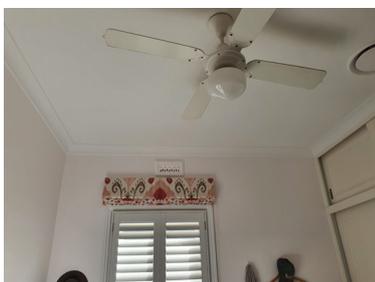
100: Original window and air vent to bedroom with new ceiling and cornices.
